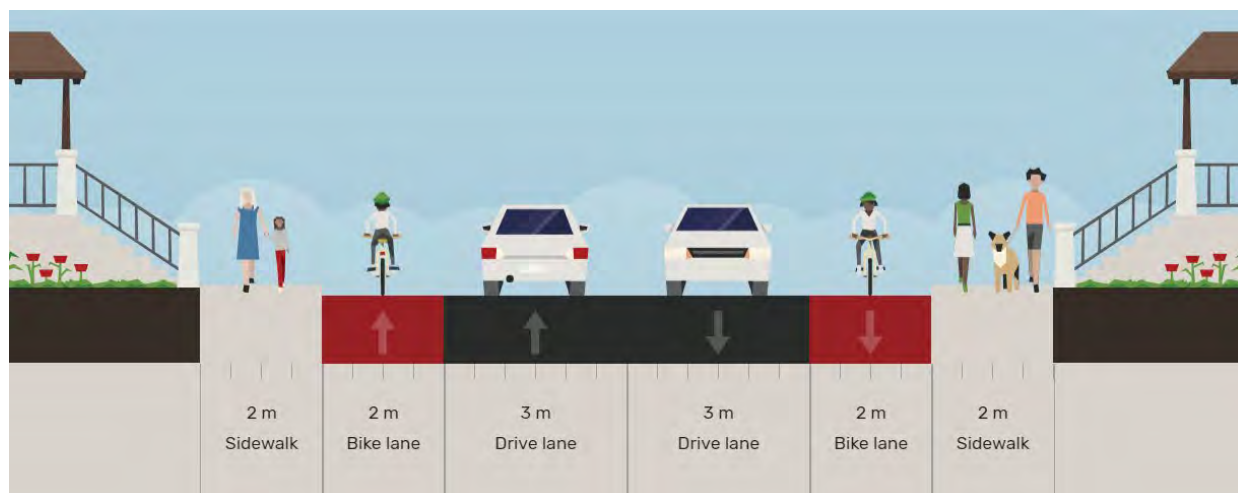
Church Road/Rock Road Option 1 - Cross-section
